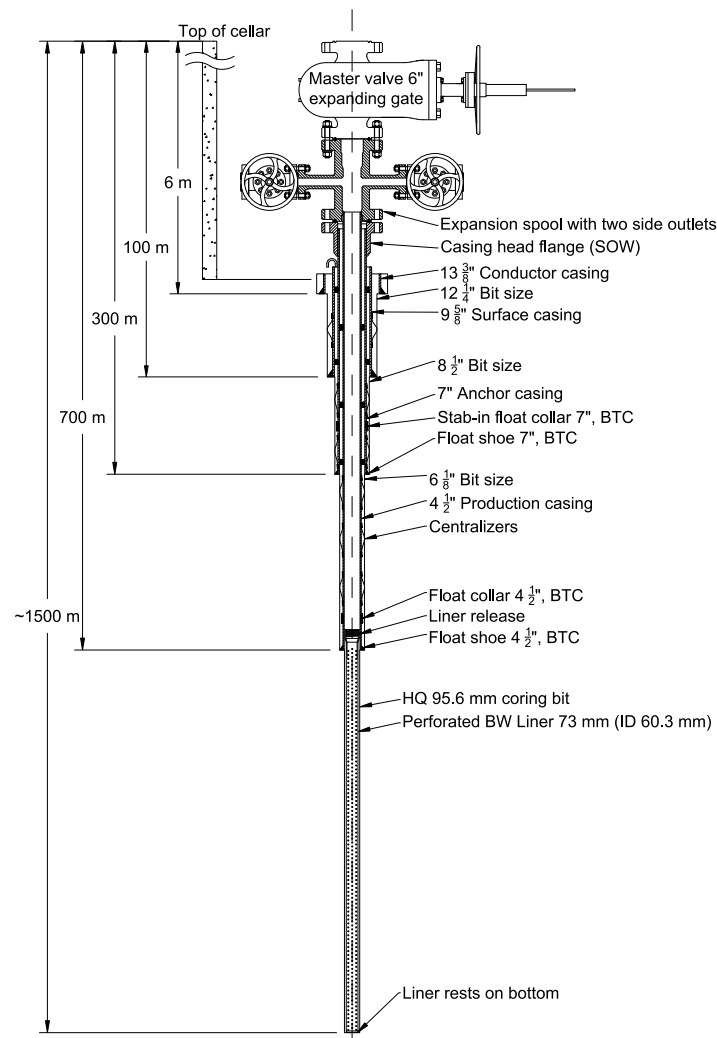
Design for a rotary drilled, 6 1/8" open hole section, slim-well.
